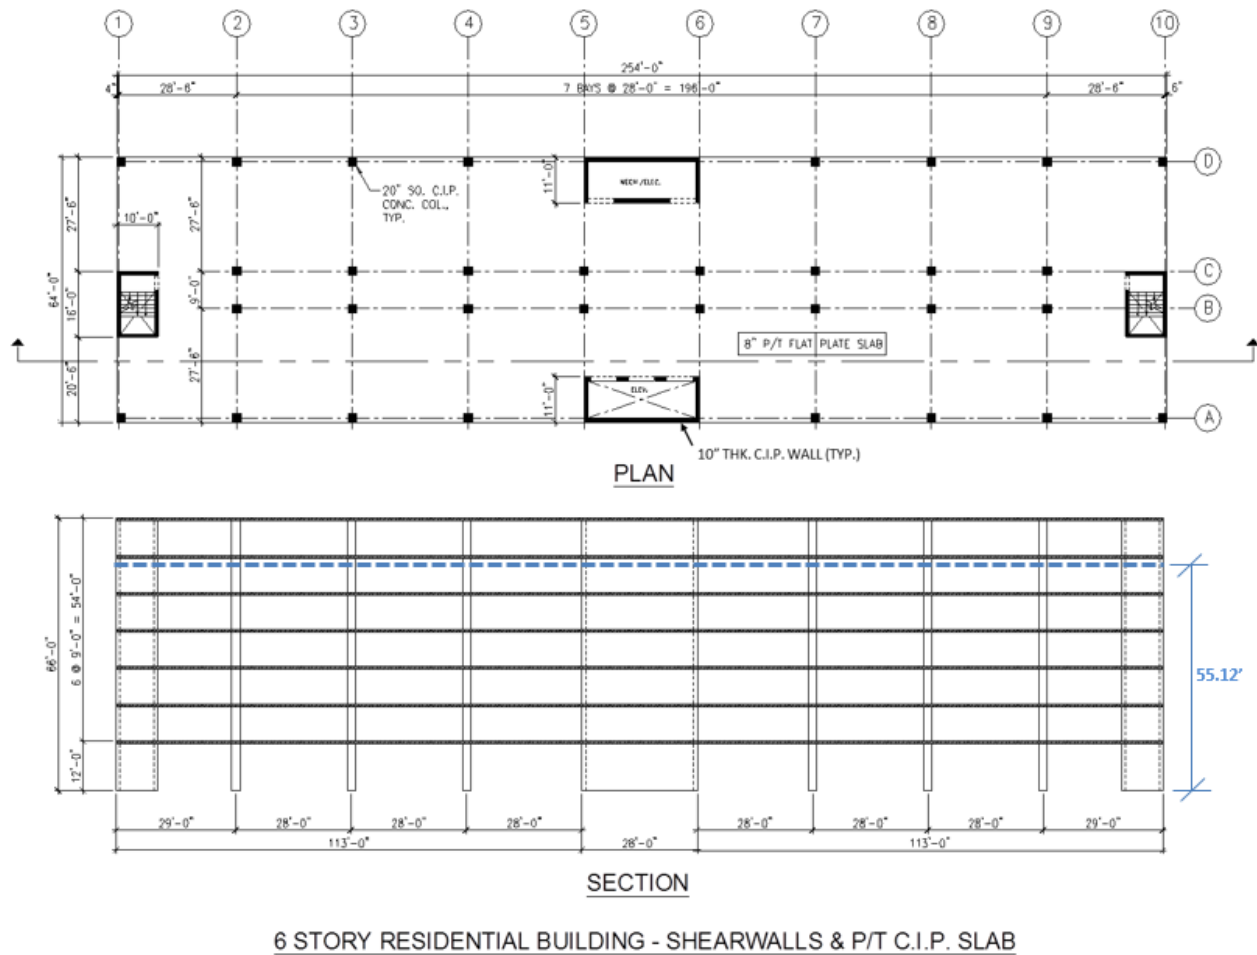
7 Story Residential Building using Special Reinforced Concrete Shear Walls and posttensioned flat slab supported on gravity columns
